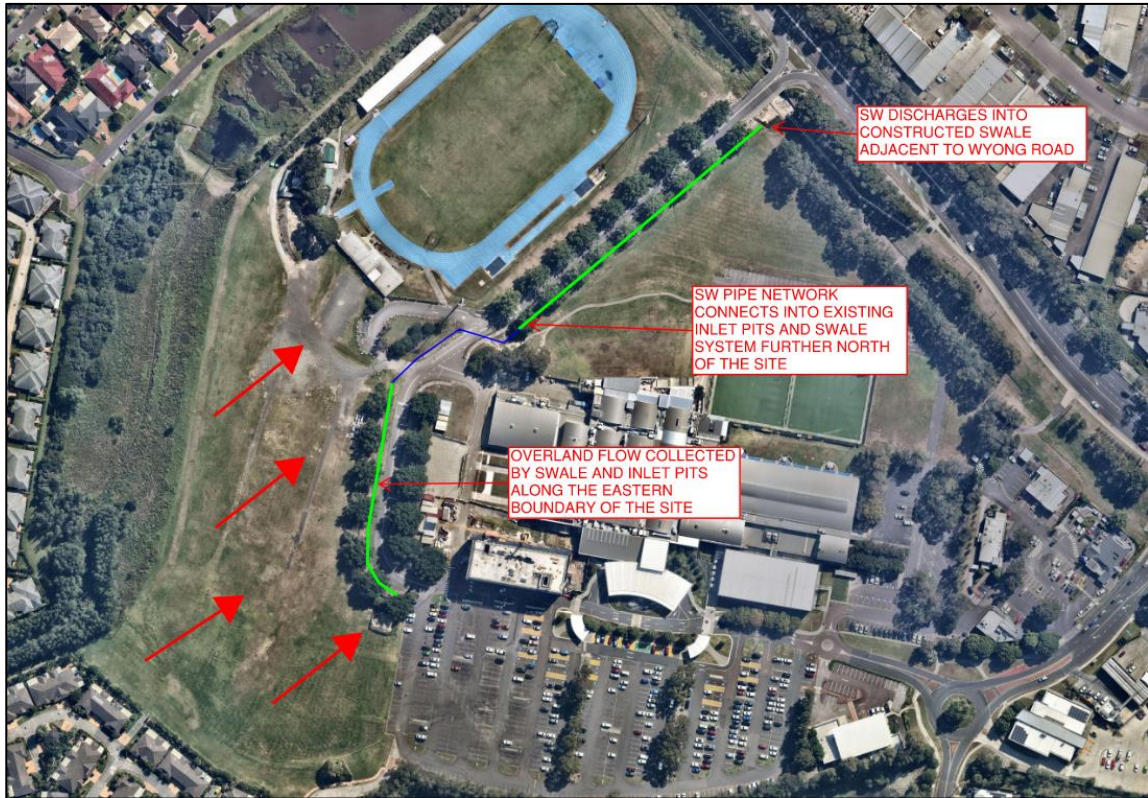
Existing Site Stormwater Discharge (Source: Nearmap 2023)
